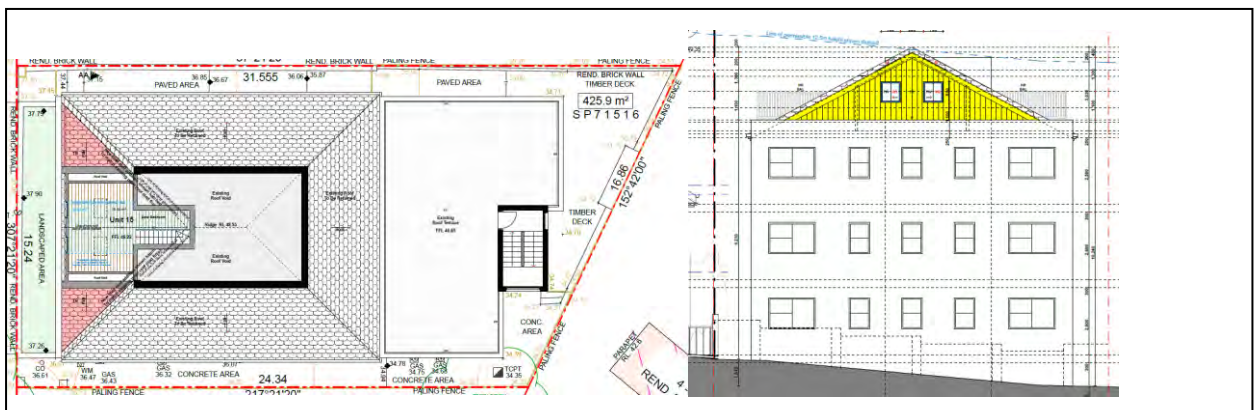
Plans submitted for PD-23/2022. (Source: iSA Designs, 2012)
